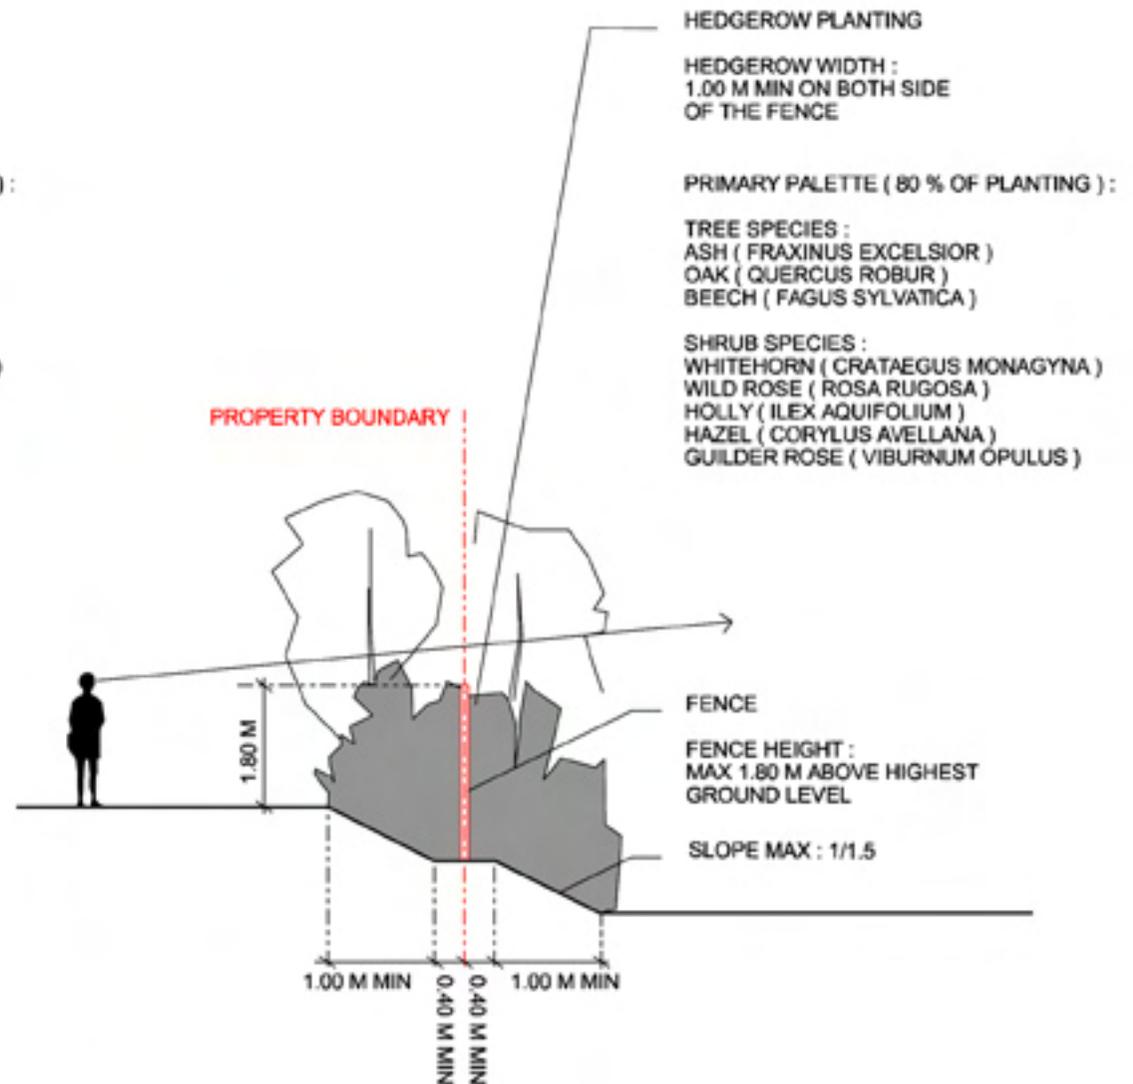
Typical arrangement of rear boundaries, scale 1:100
